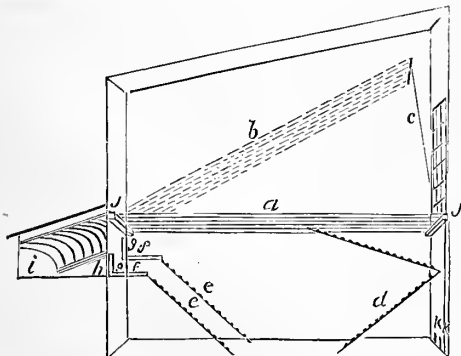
INTERIOR OF POULTRY HOUSE.
